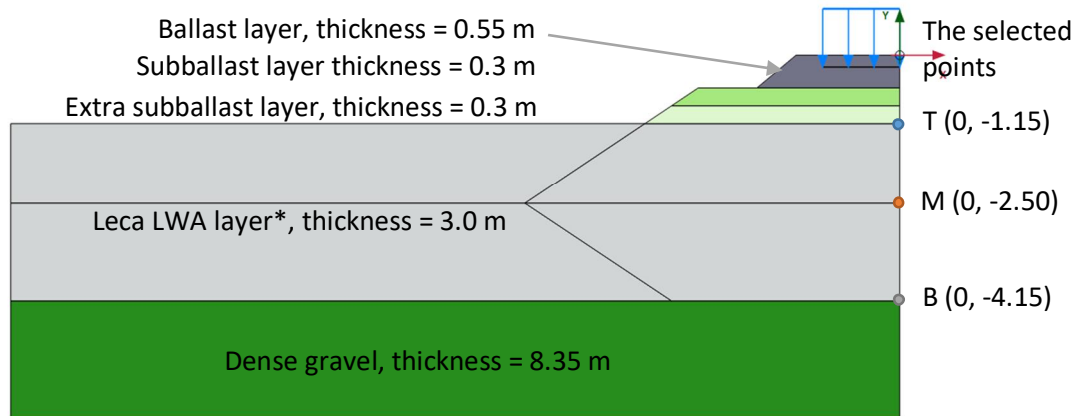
The cross section for cyclic loading analysis. \*This approach of modelling Leca LWA (without proper excavations) must ensure the sufficient embankment stability.
